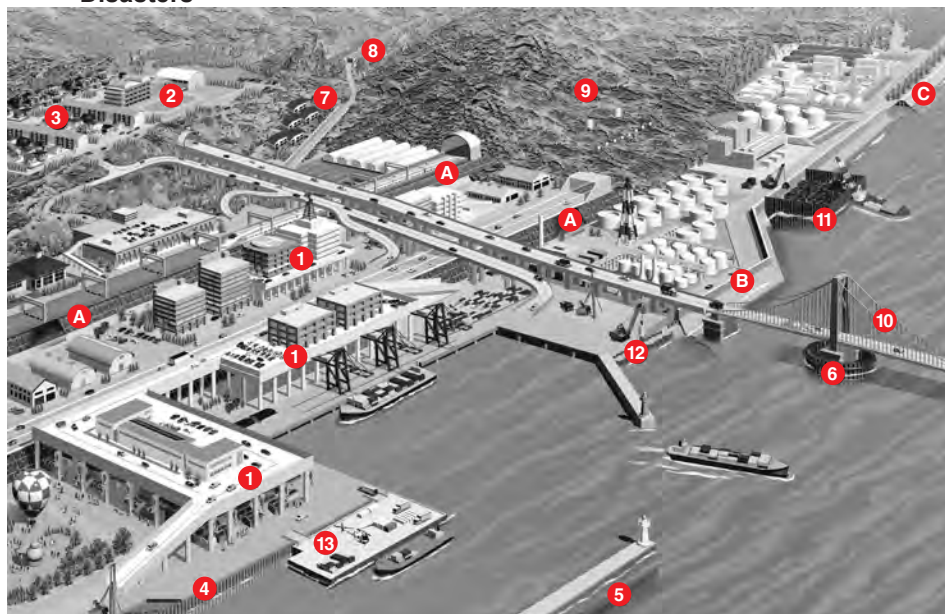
Type of Corrosion-protection Measures for Port/Harbor Steel Structures
